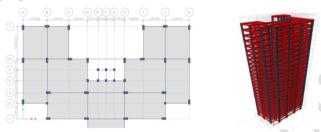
Moment Resistance Frame structural flooring plan and model
